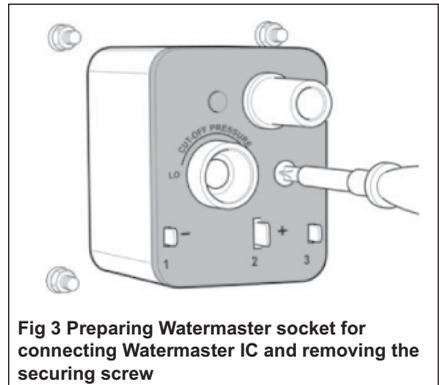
Preparing Watermaster socket for connecting Watermaster IC and removing the securing screw
